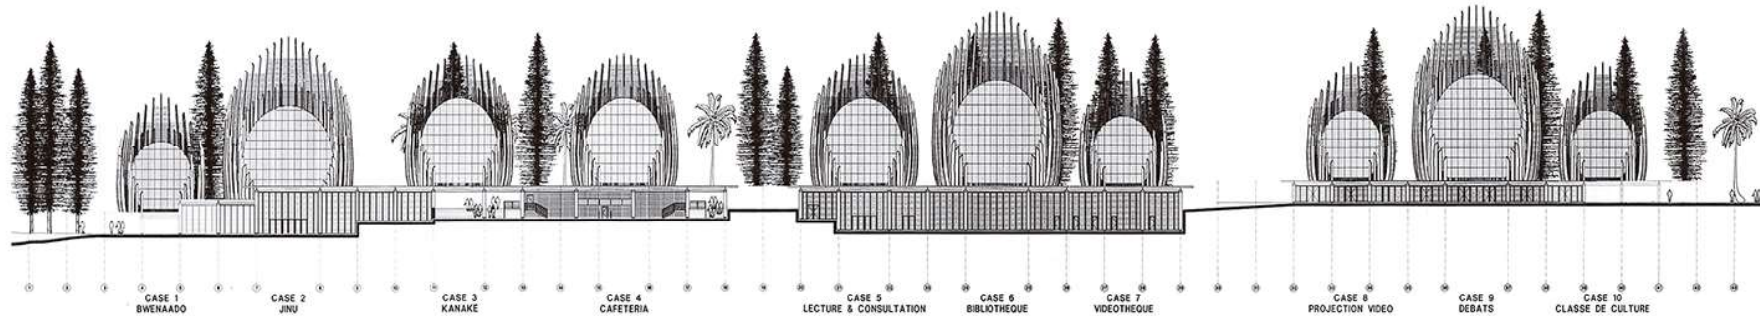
Site section showing pavilion of Jean-Marie Tjibaou Cultural center, (Source: Archdaily, 2020)
